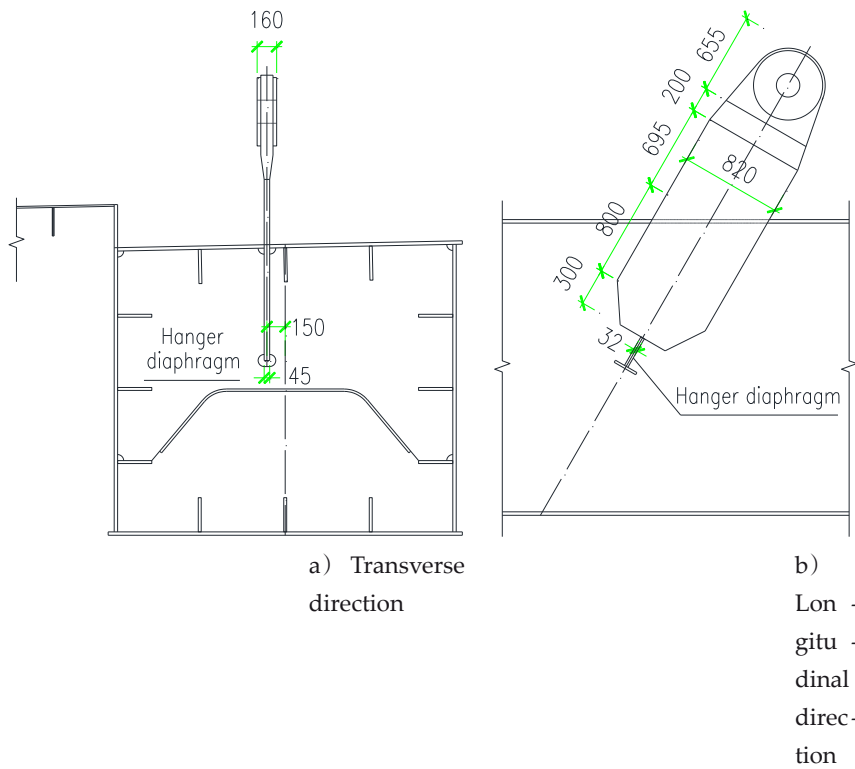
Anchorage detail of a hanger at the girder end (unit: mm)
